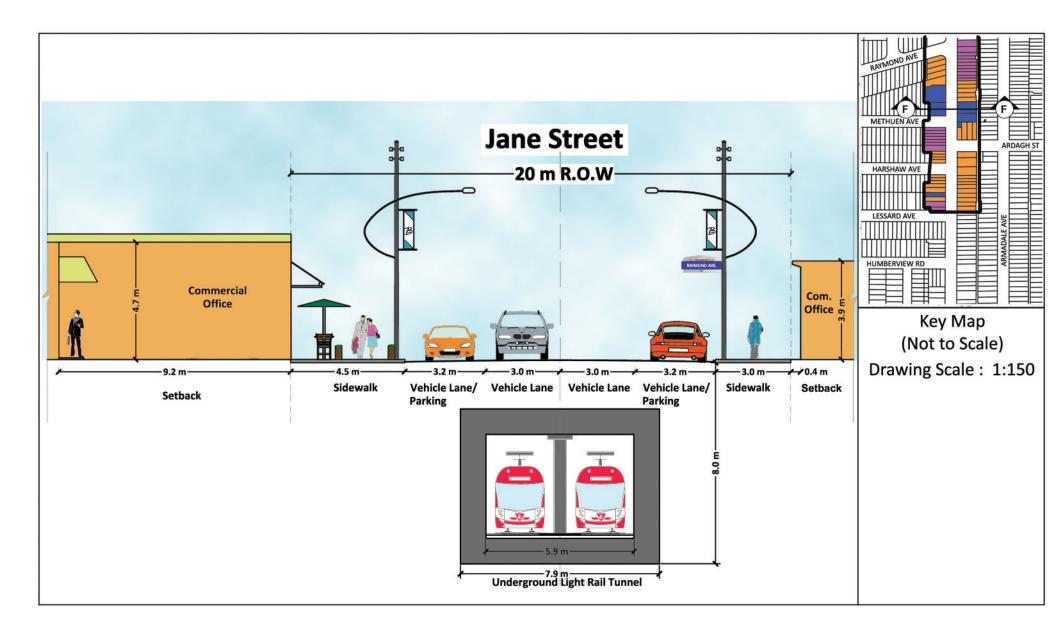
Jane Street Cross-section F (LRT Underground, Commercial on Both Sides)
